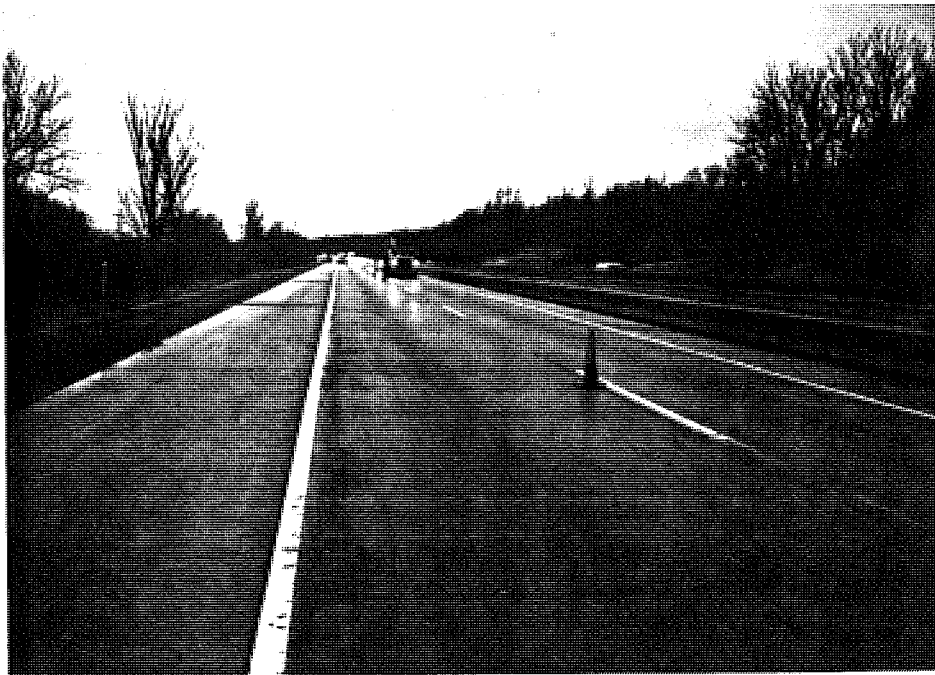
Overview of section MI2-1 (West bound Galesburg).
